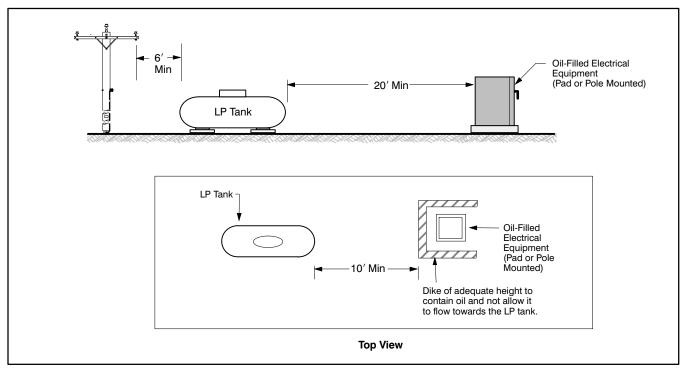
Minimum clearances from oil-filled equipment to LP, hazardous liquid, or fuel tanks
